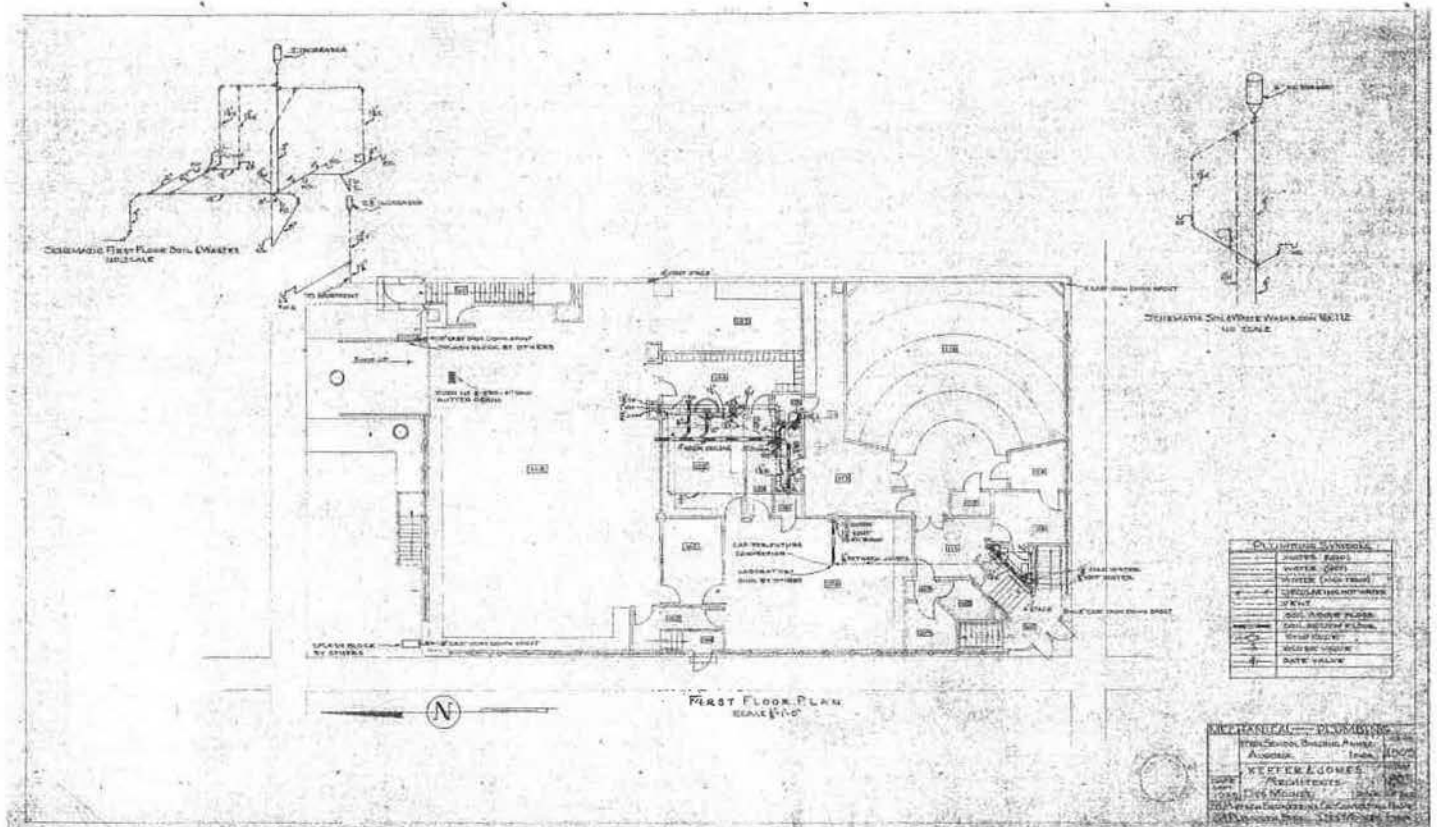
School Annex, First Floor Plan (Drawn by Keffer and Jones Architects, 1949)
